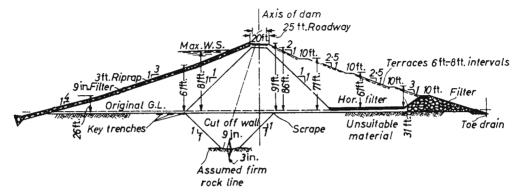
Typical section—Lower Bhawani Earth Dam Section typique du barrage en terre à Lower Bhawani
